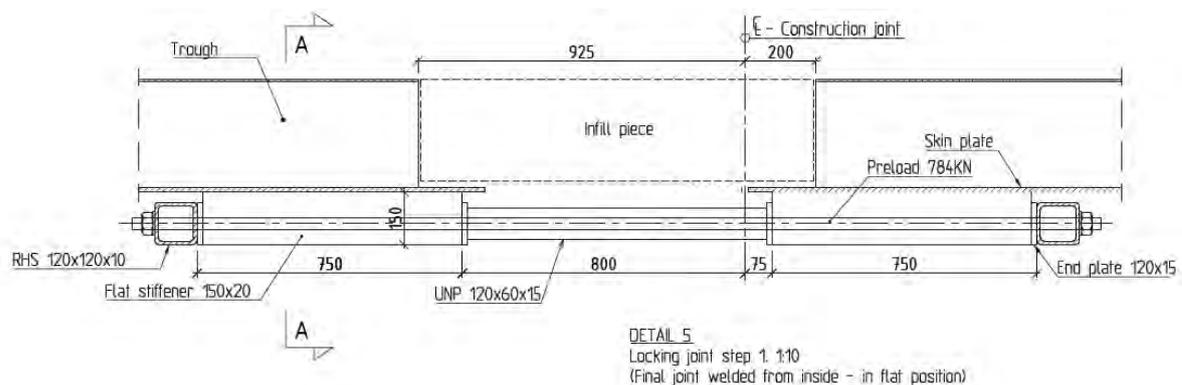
Locking joint for web- and bottom plates, construction joint 3 inclusive 800mm infill piece, longitudinal section
